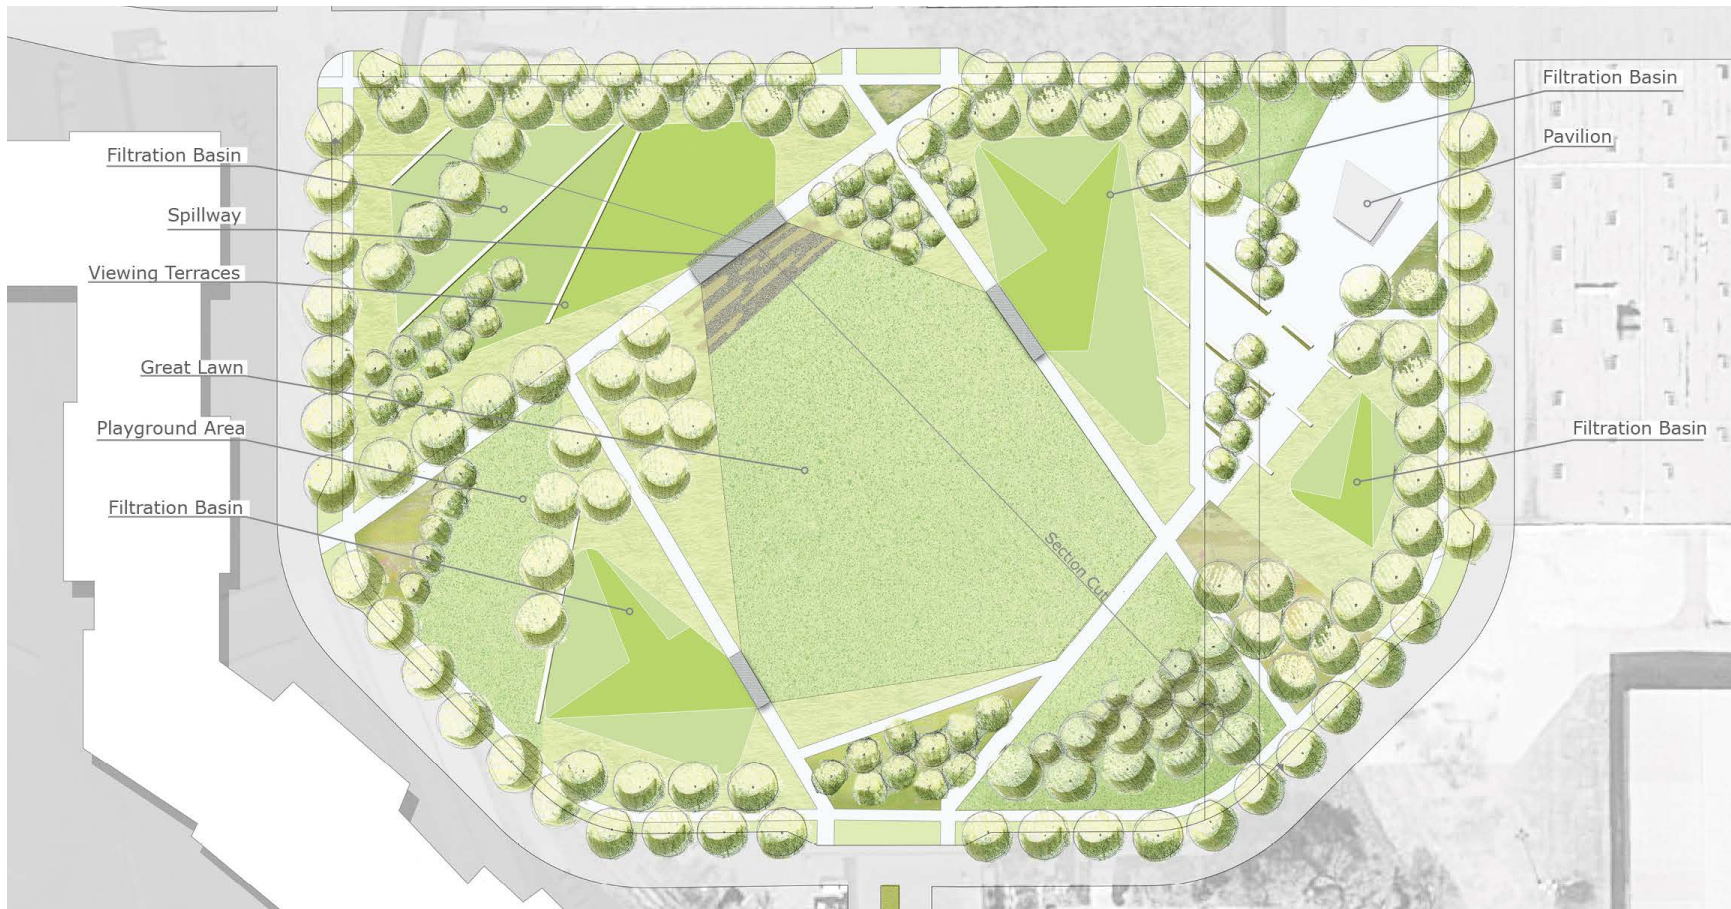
Curfew Commons Concept: Illustrative Plan - Canopy View with Section Line
